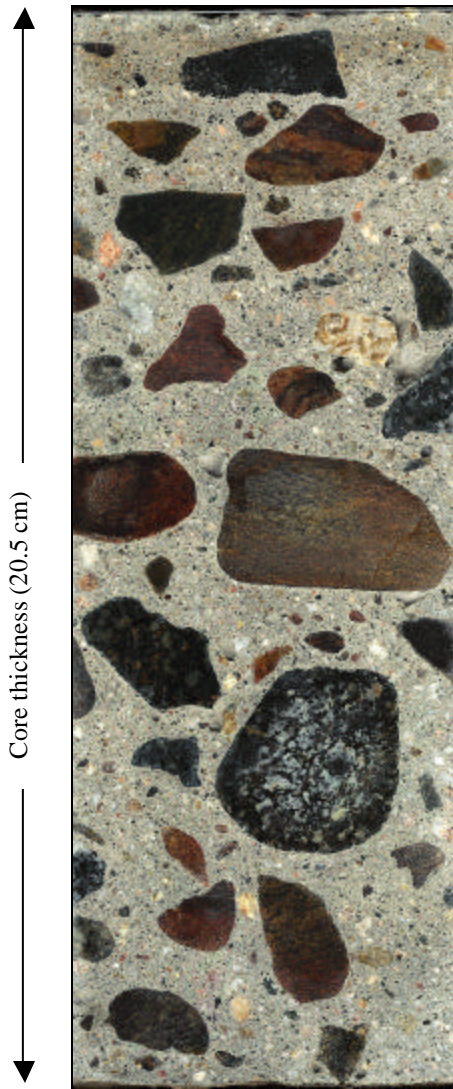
Polished cross-section of pavement section 06-3021.
